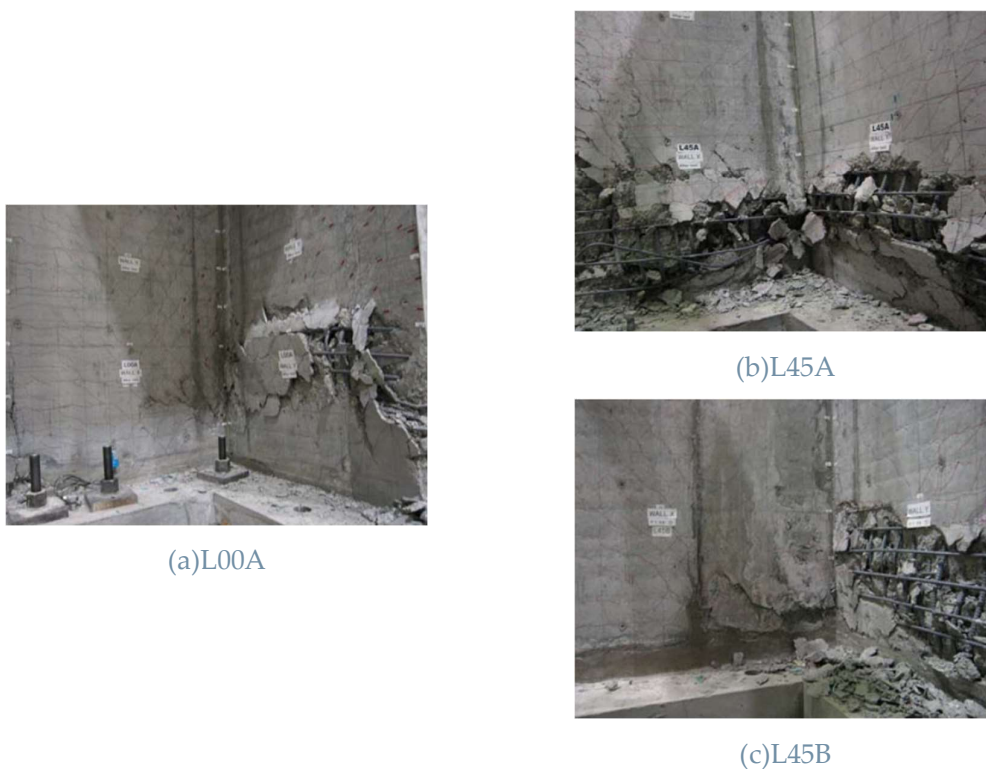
Failure of the Walls (Inada et al., 2008)
